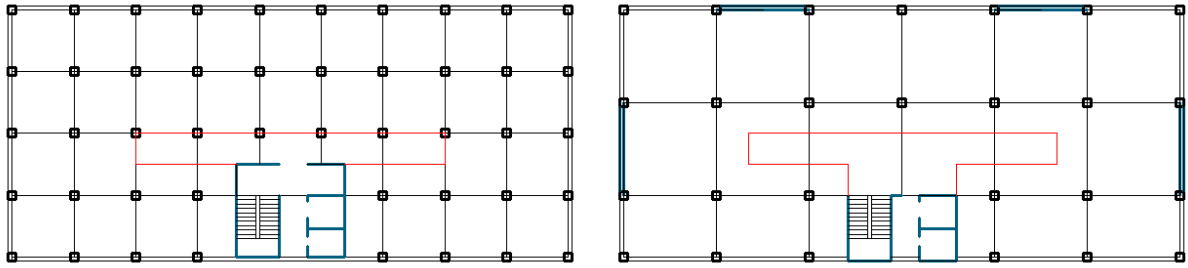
Rectangular building configuration with plan dimension 16x36m: left – structural plan with a grid of enclosed columns and with an enlarged service core placed in excentricity of the structural plan configuration; right – structural plan with four perimetric perforated structural walls 6m wide with an enclosed service core and with a grid of enlarged coloumns (source: the author)
